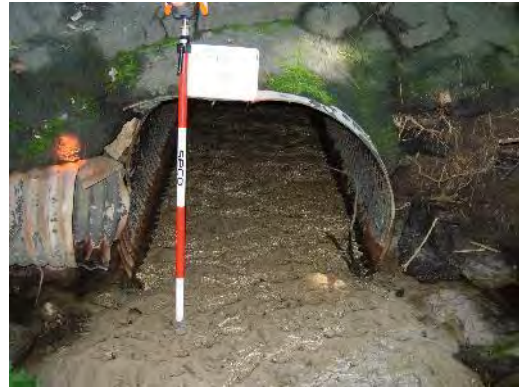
Reedy Branch: Driveway off Greenville Boulevard Upstream Face
